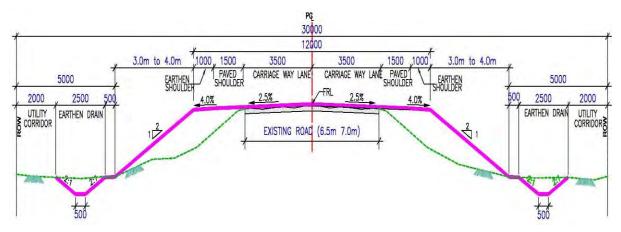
Typical Two Lane Road Cross Section in Urban Area
